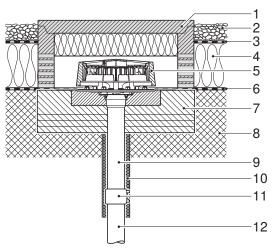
Installation in a solid roof (roof structure: inverted roof) insulated with roof foil, gravelling
